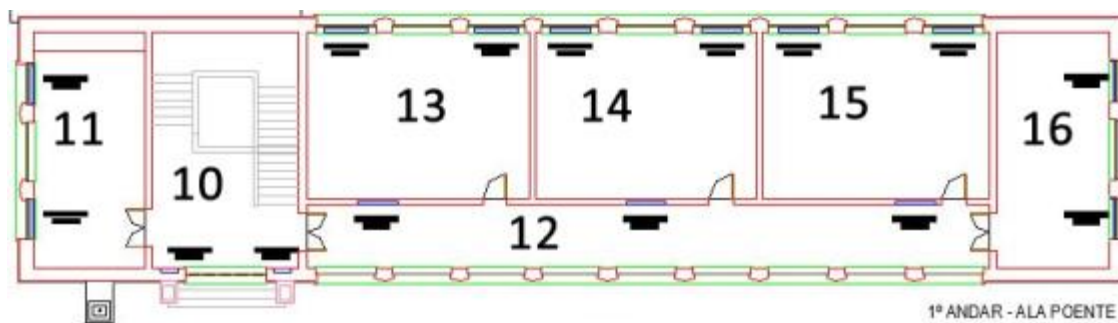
ROOMS USE IN BLOCK 1, FLOOR 1
